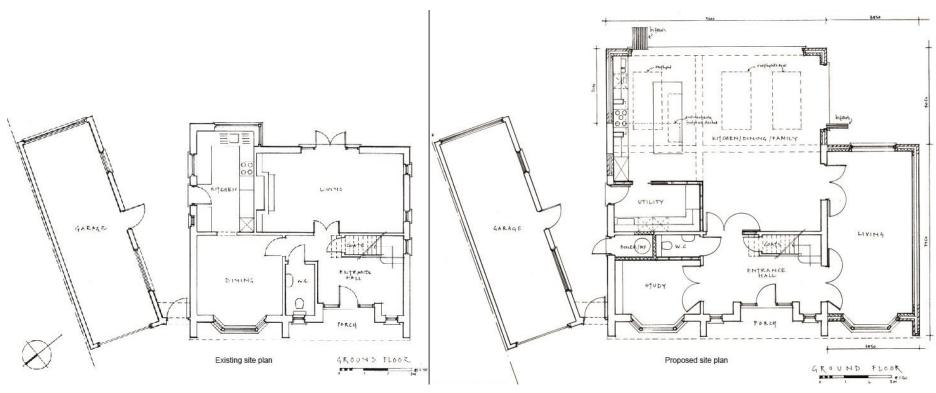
Existing and proposed ground floor plans. Adapted from drawing No. 2153/E/01 and 2153/P/01 by the Design Haus
